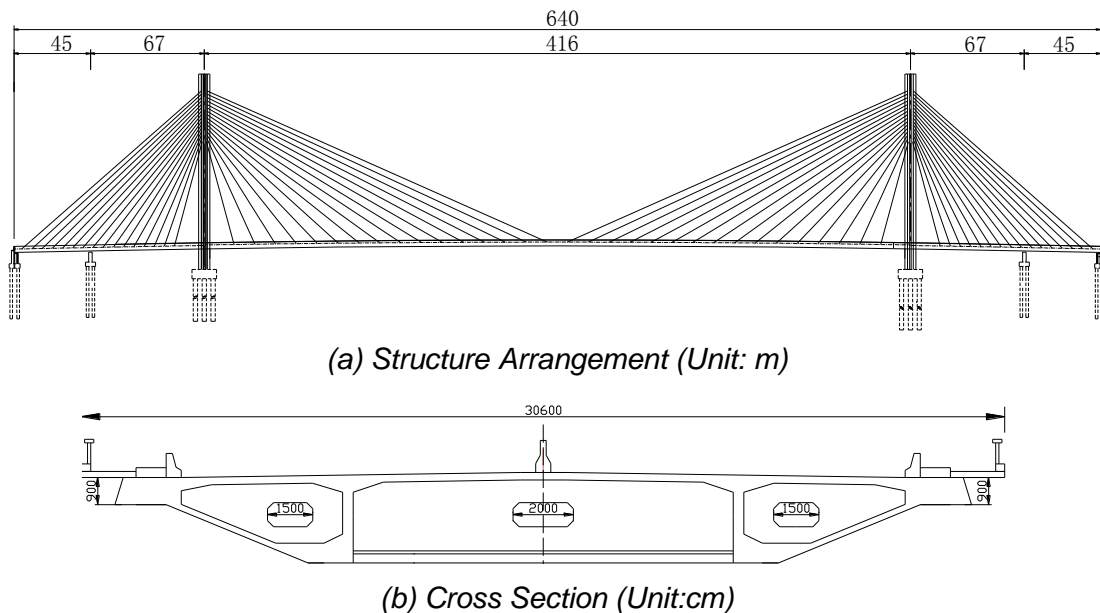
Arrangement of Huai'an cable-stayed bridge. (Unit: m)
